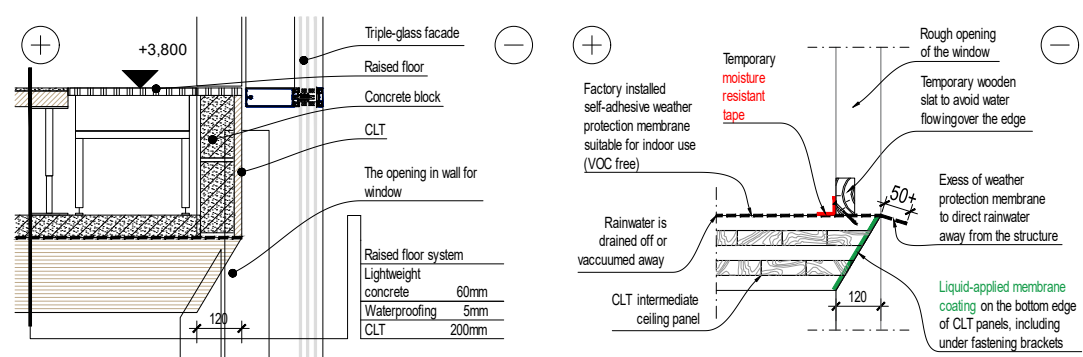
Design drawing (left) of the intermediate ceiling to window connection and our proposal (right) of wetting mitigation practices.
